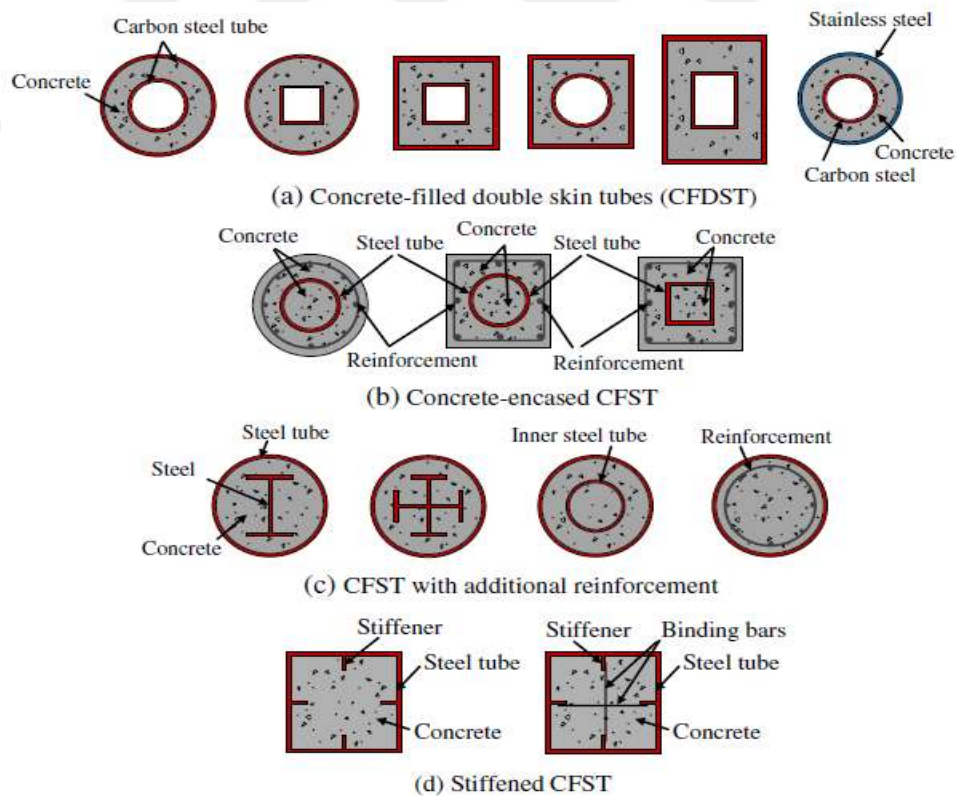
Typical types of concrete-filled steel tube (CFST) members (Han et al., 2014)
